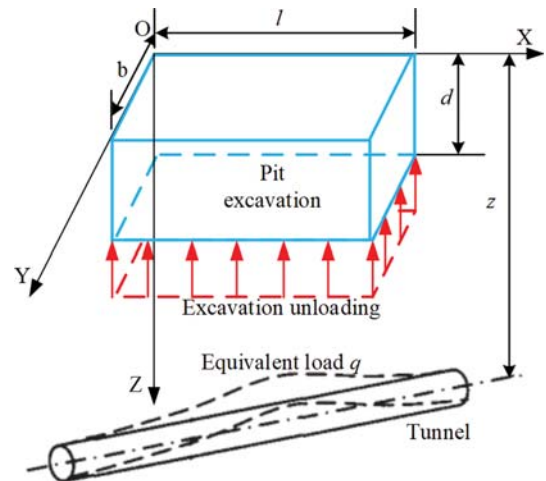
Schematic Diagram of the Upper-Level Crossing Tunnel for Excavation and Unloading of Foundation Pit
